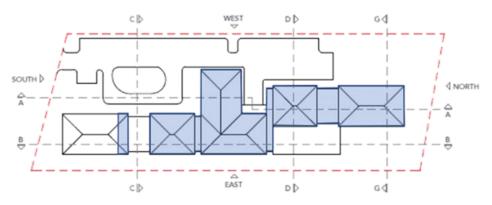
Section Plan Key, approximate extent of height breach outlined blue (Source: Team 2 Architects)
